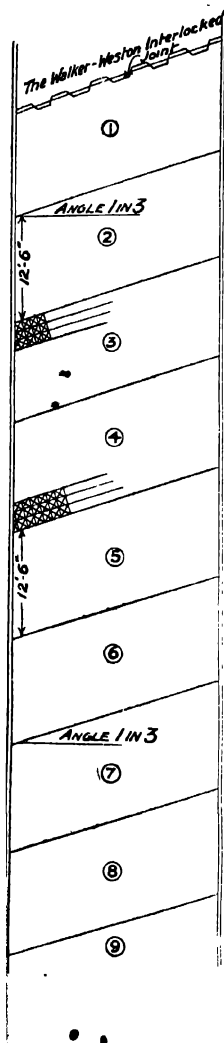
Plan of Walker-Weston Reinforcement with Alternate Bay Construction.
